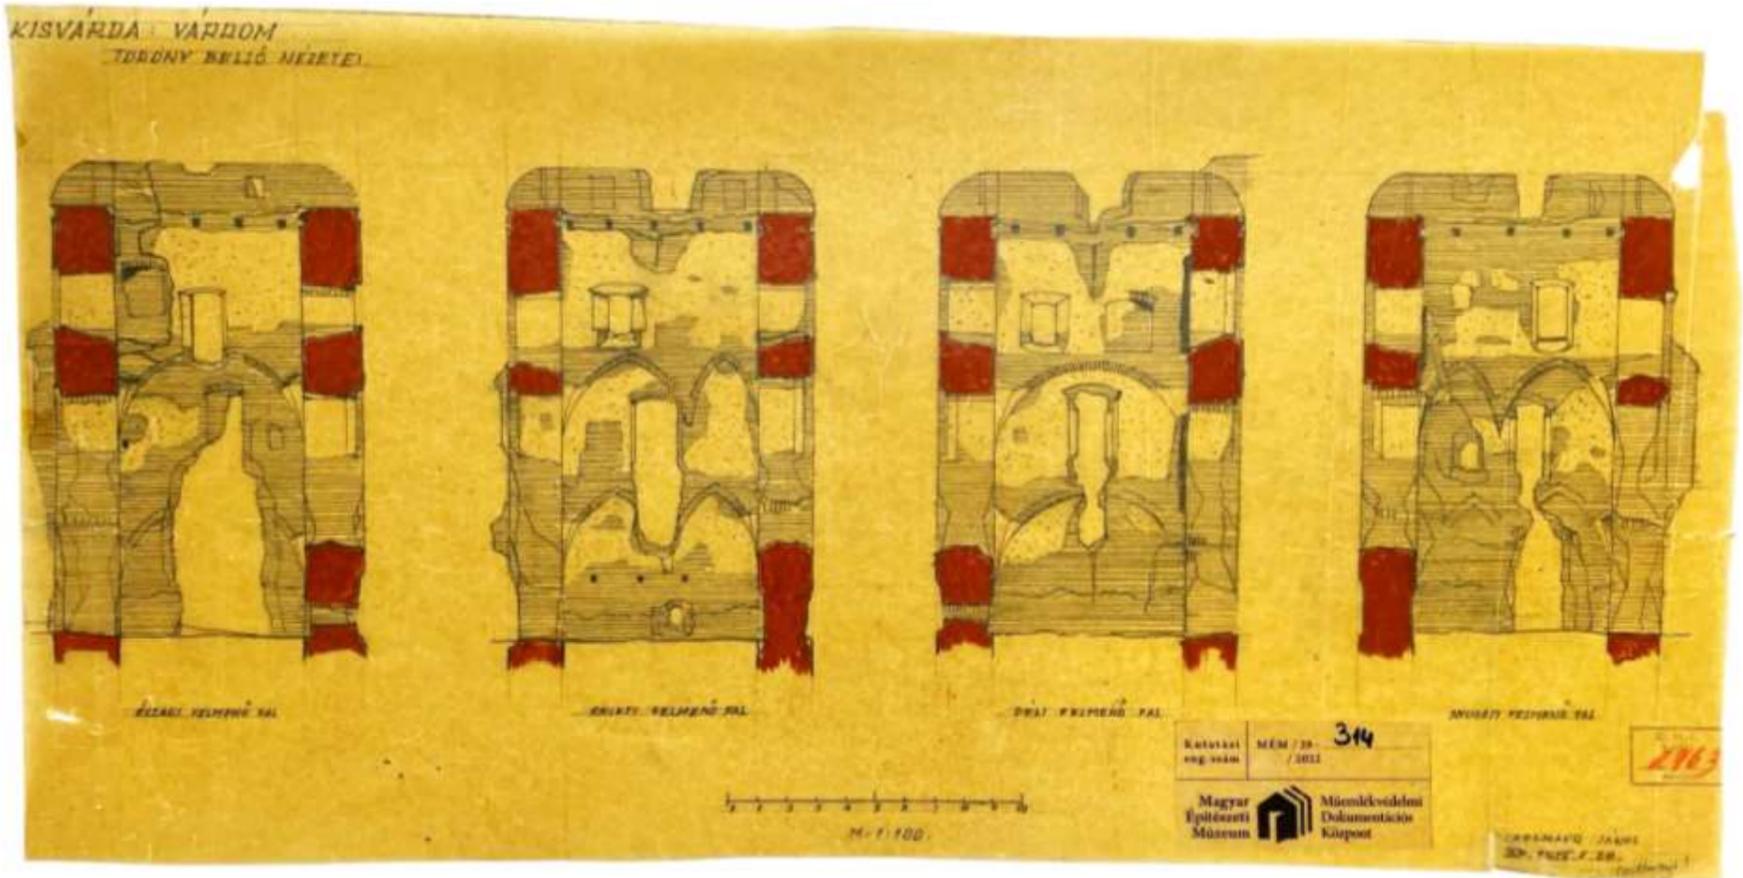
János Sedlmayr's survey, the inside of the southeast tower. (MÉM MDK Architecture Plan Collection, 2963. sheet.)
